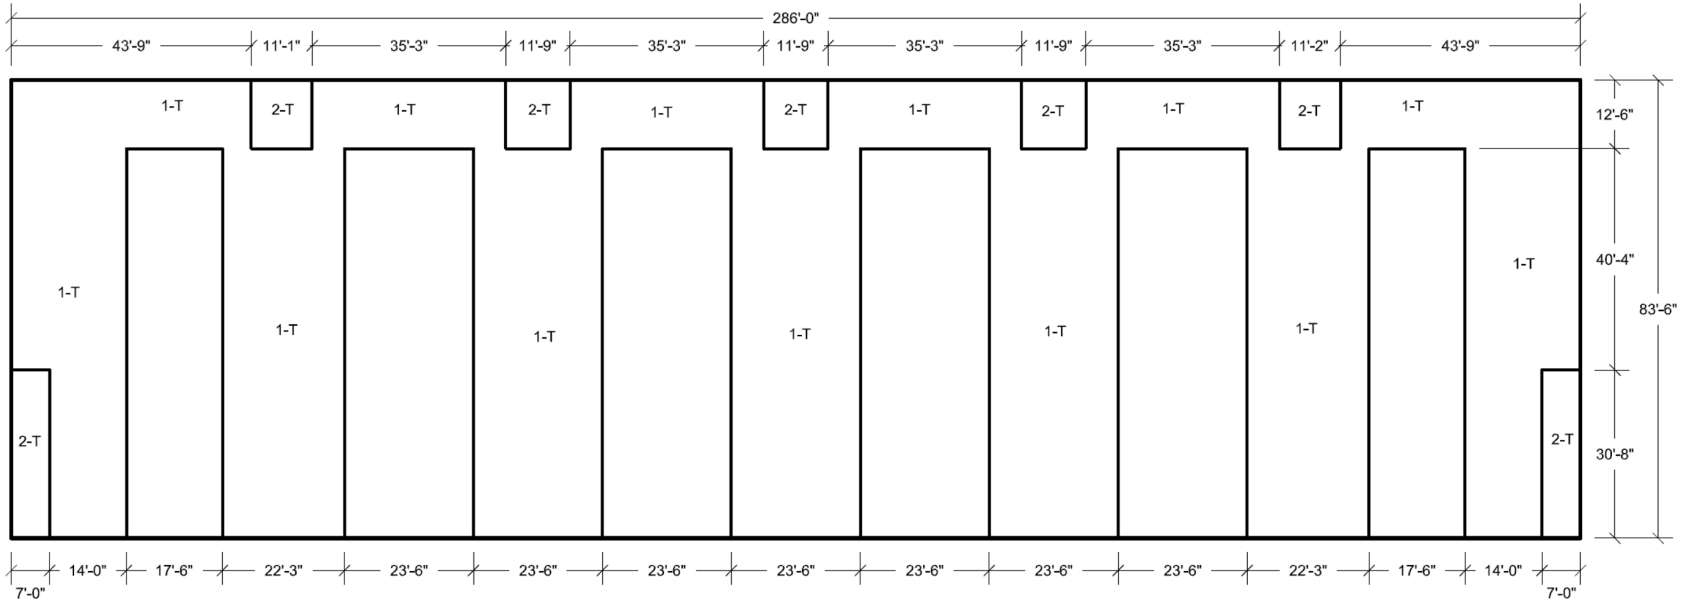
H.6-91 UHS Basin South Wall Looking North Transverse Reinforcement Zones
